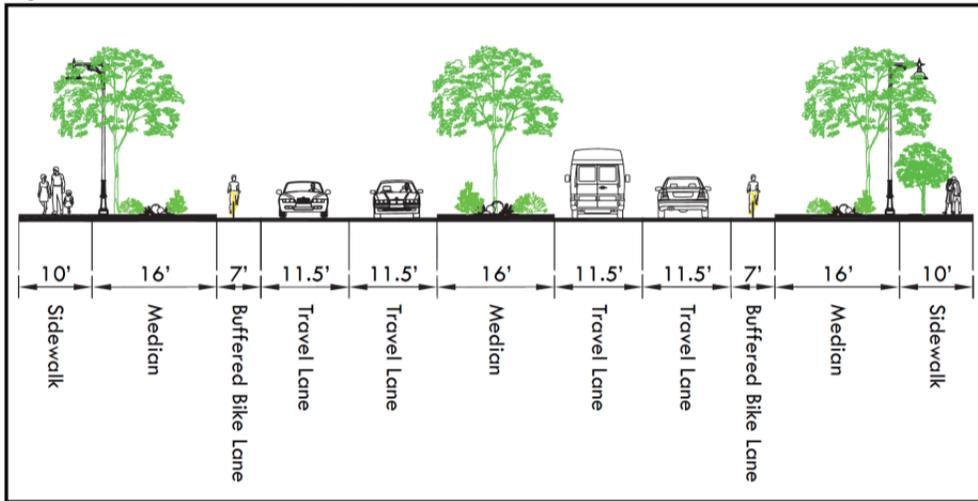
Middle Cross-Section, Henderson Avenue to Mississippi Avenue (175 Feet Wide)
